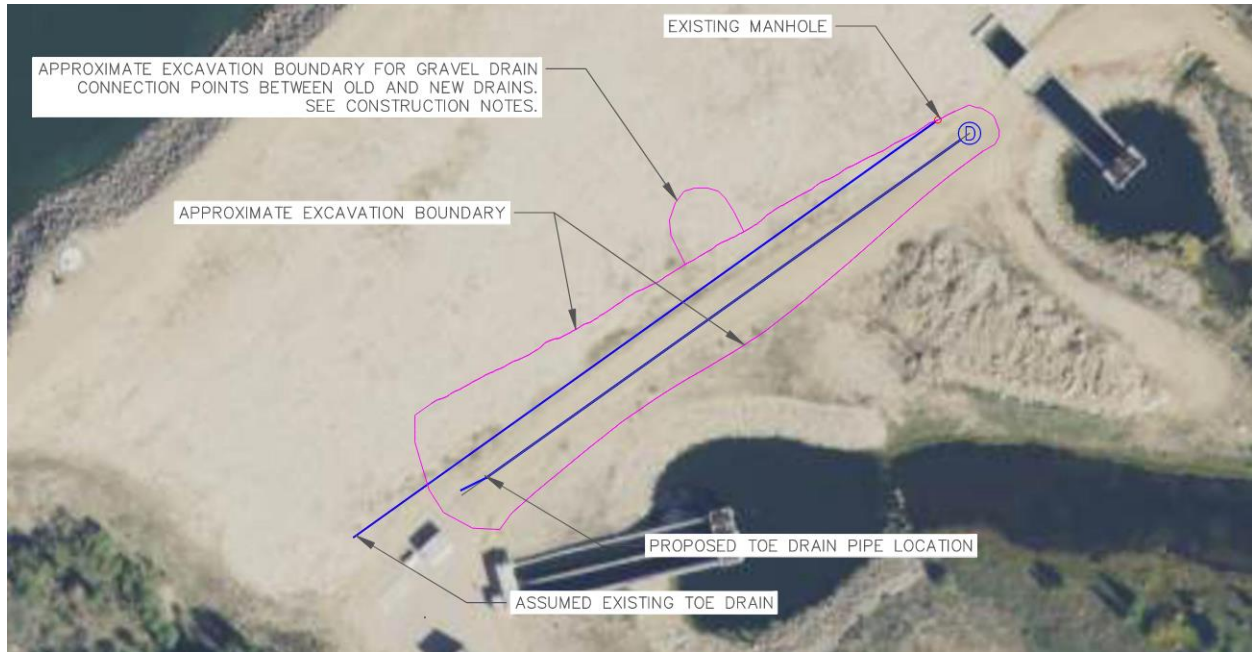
Plan View Showing Proposed and Current Toe Drain Locations
